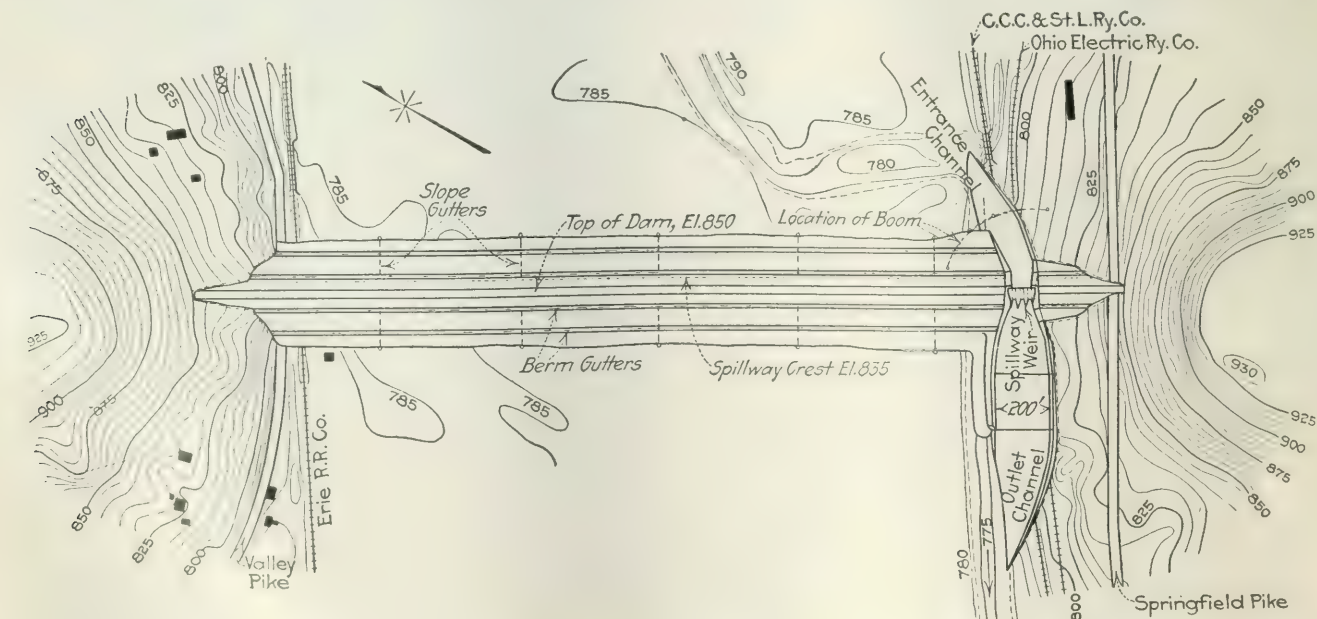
PLAN OF HUFFMAN DAM, WITH COMBINED SPILLWAY AND CONDUITS
